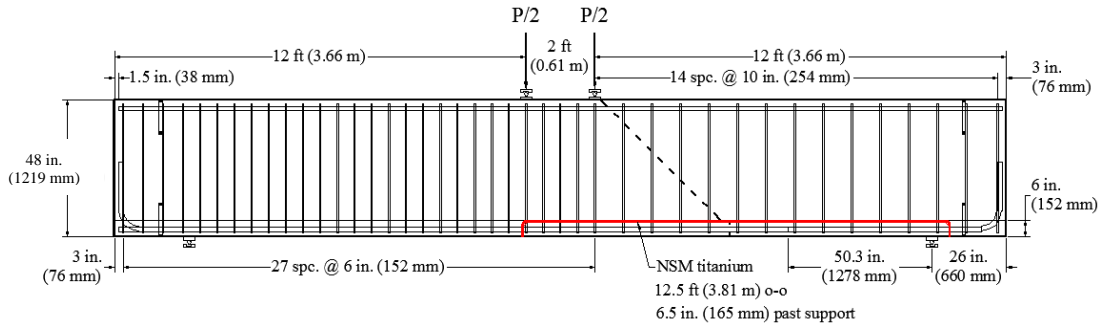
Elevation of specimen IT.45.Ld3(10).Ti.
